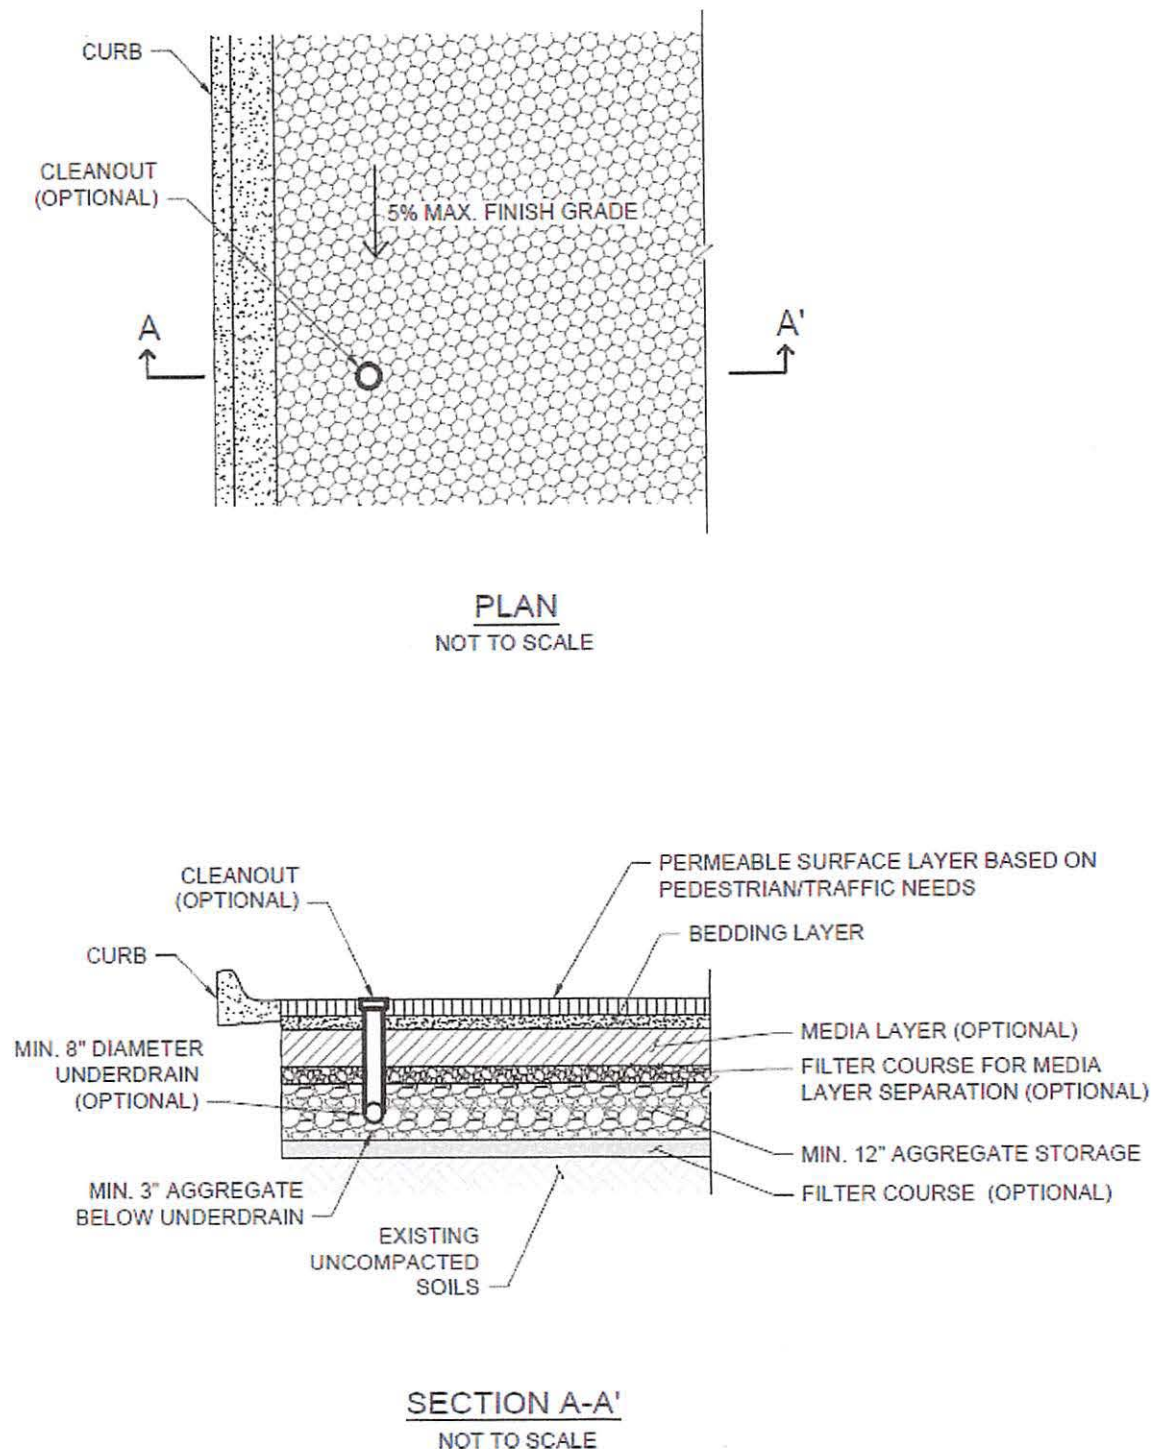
E.11-1: Typical plan and Section view of a Permeable Pavement BMP
